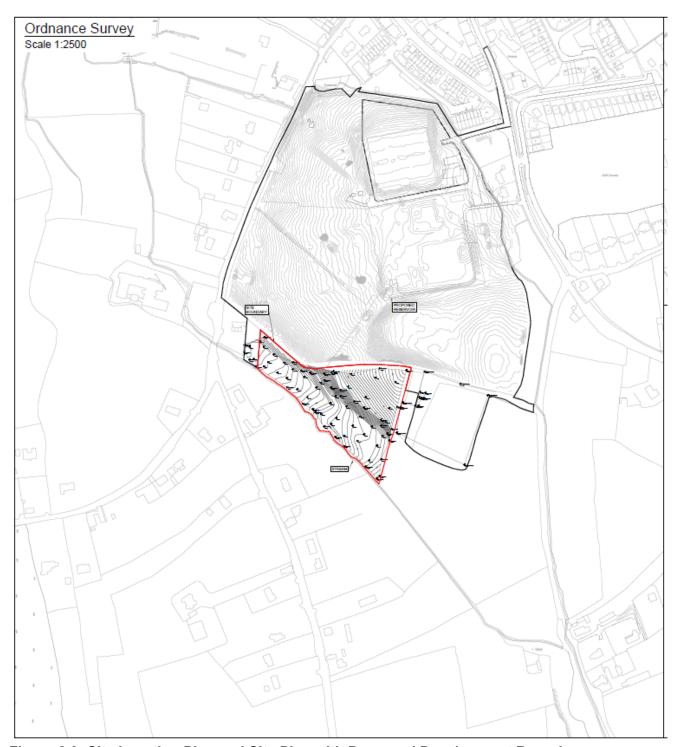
Site Location Plan and Site Plan with Proposed Development Boundary
